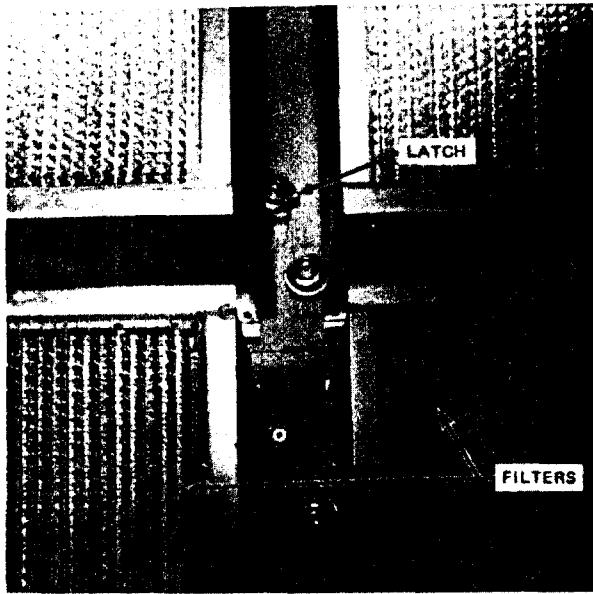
Window latch latching devices for clamping filters. Latches bear on backs of the front flanges of the filters. This method is not reliable for installing HEPA filters.
